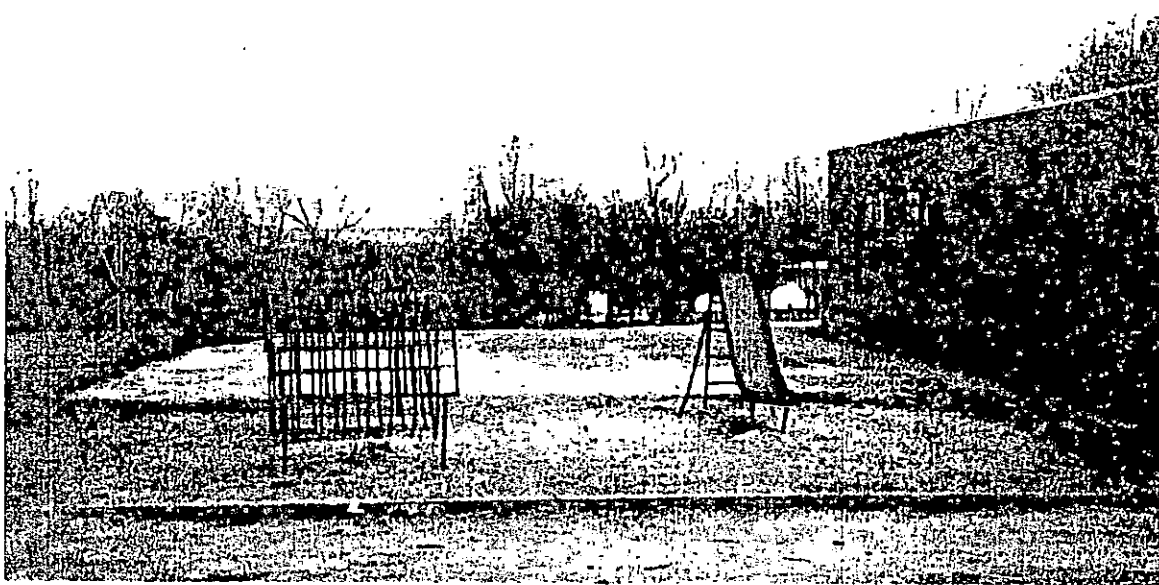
John Bayne Elementary School — Existing playground surface does not meet current safety and barrier-free standards.
